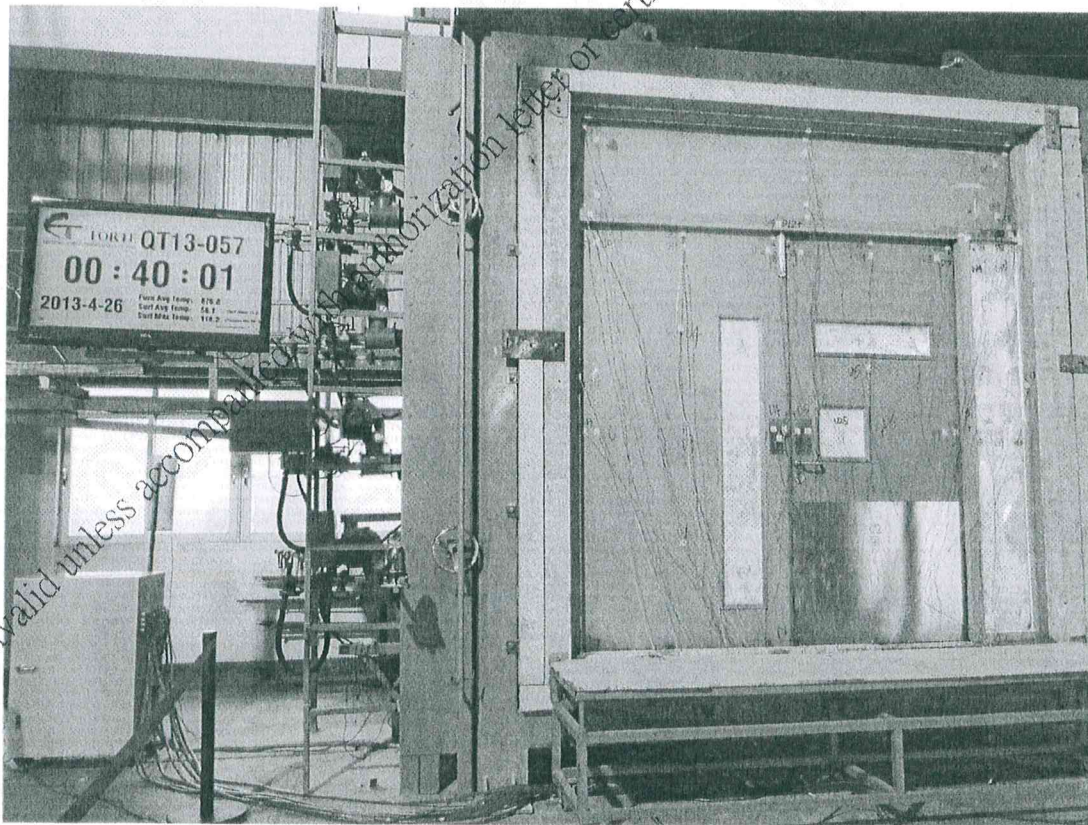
Unexposed surface of the specimen before the commencement of test.
